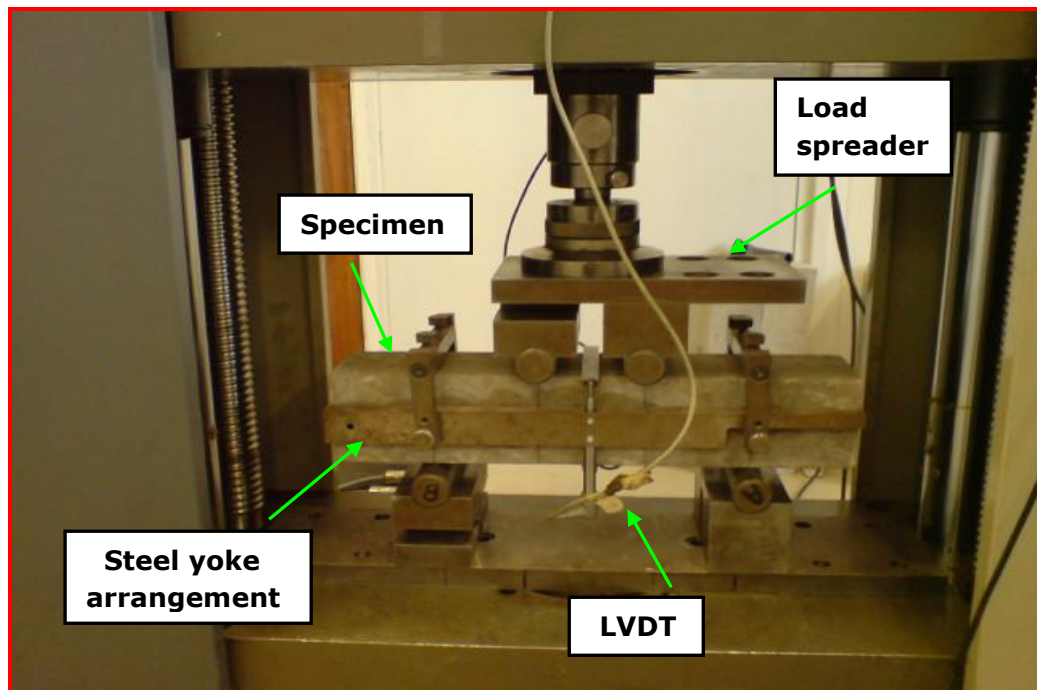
Instrumentation of the concrete beam used for the four-point bending test
